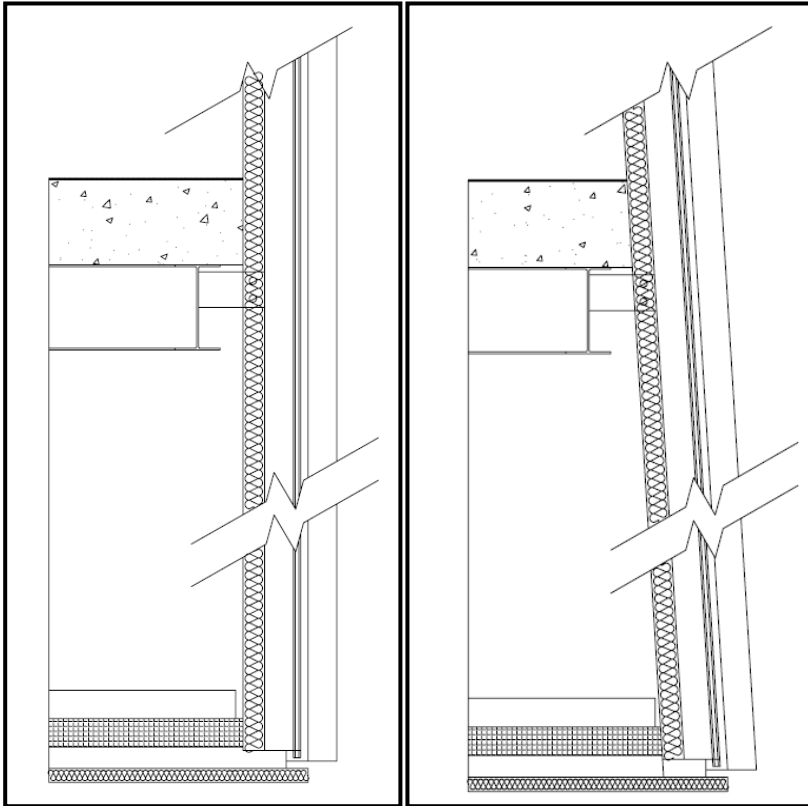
The proposed alternate curtain wall detail shown in comparison to the current design detail at its maximum tilt
